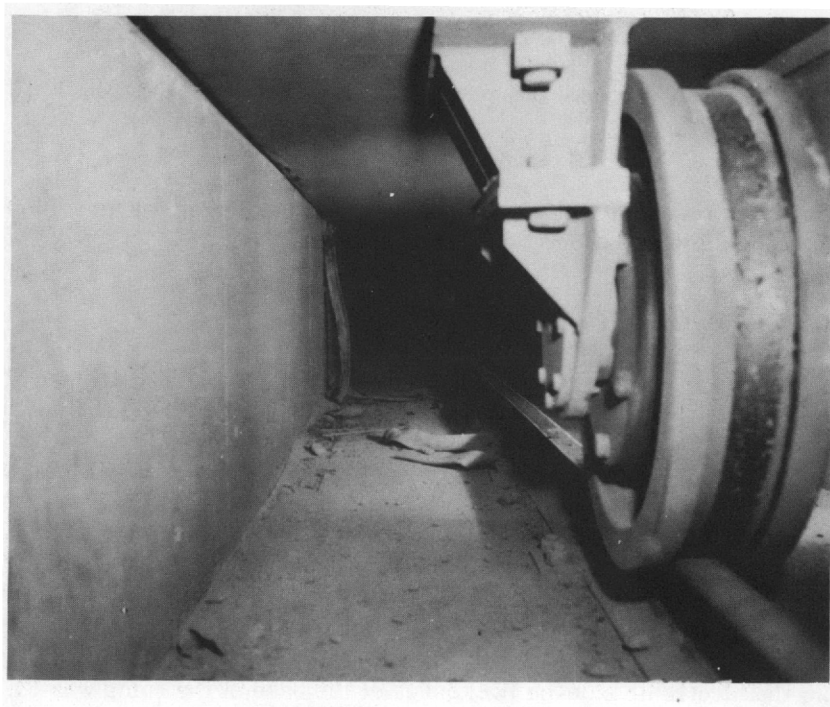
Wheel assembly and rails, door partly open (postshot).
